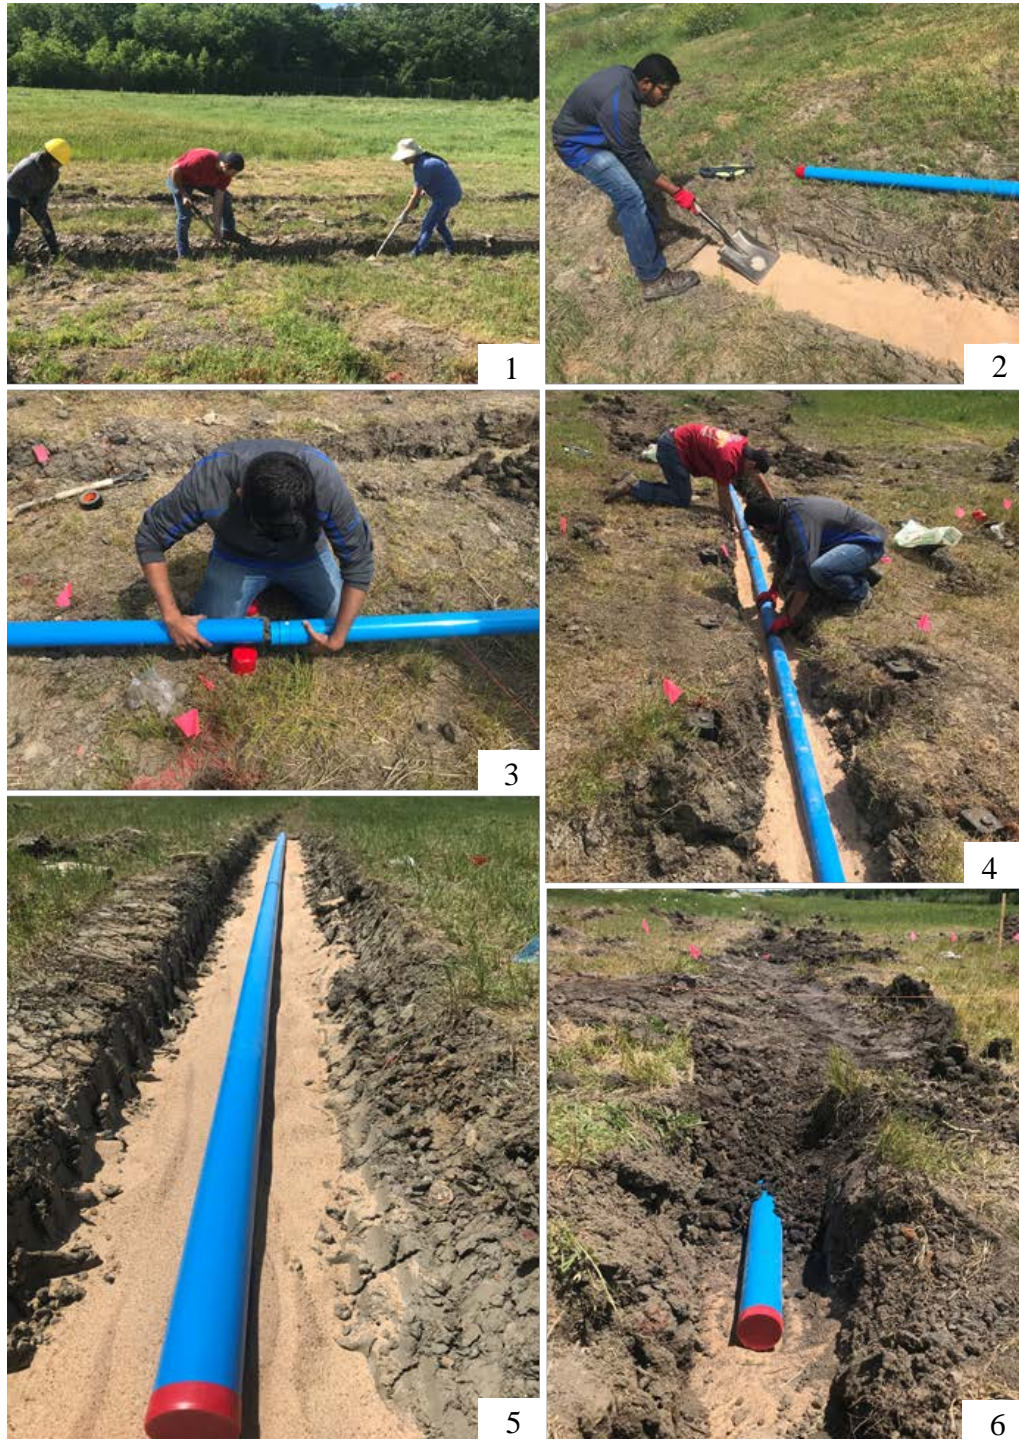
48 Installation of horizontal inclinometer for the vertical loaded test section.
